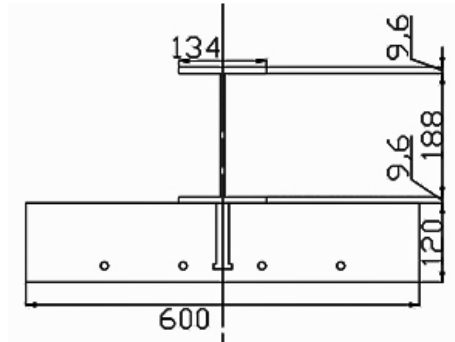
Composite Beam Cross-Section in Negative Bending and Axial Tensile Loads.
